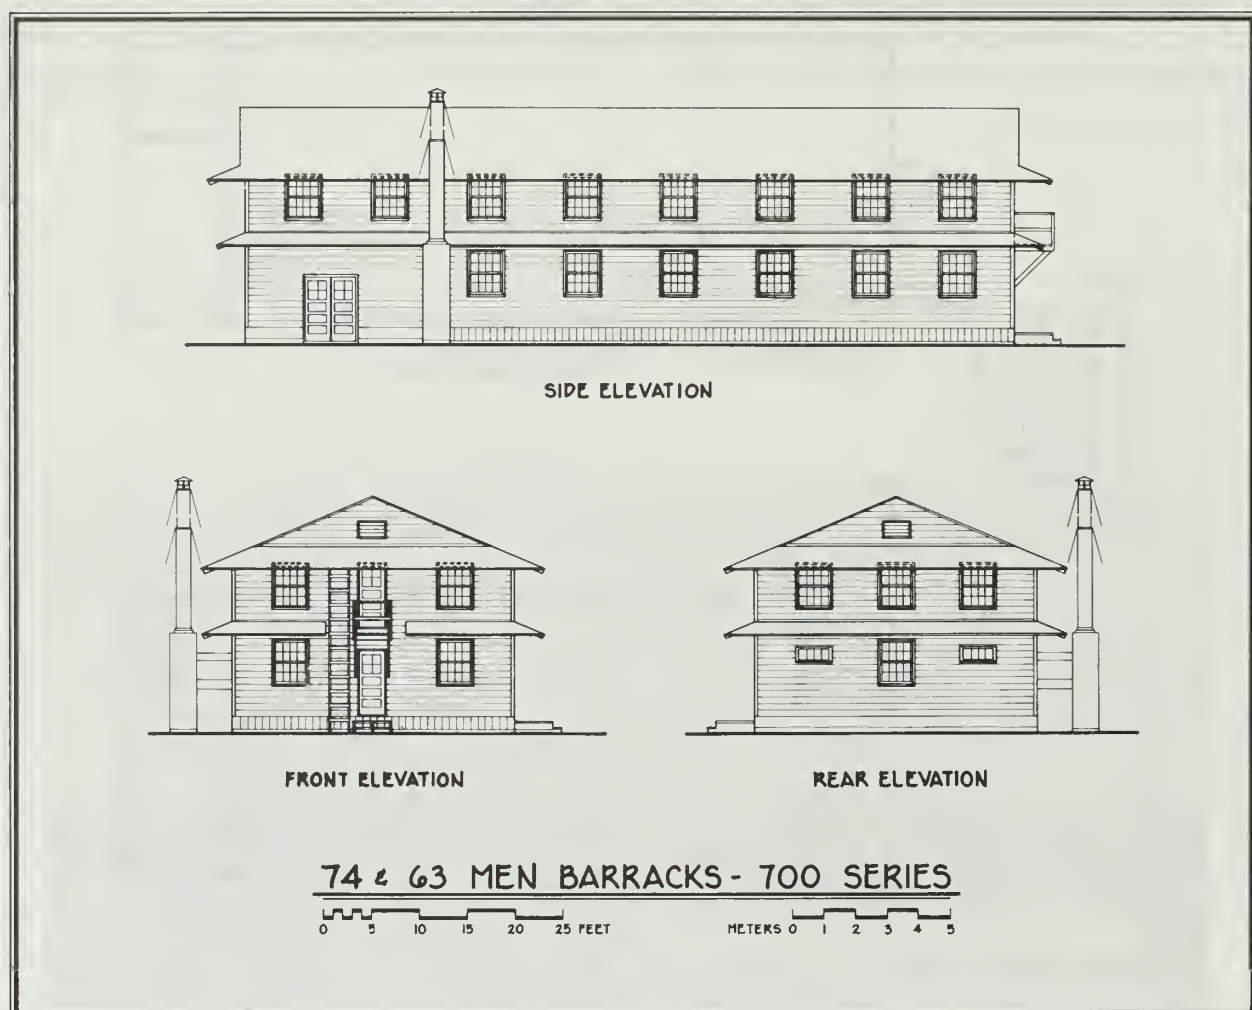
Elevations of 45 & 63 Men Barracks - 700 Series.
